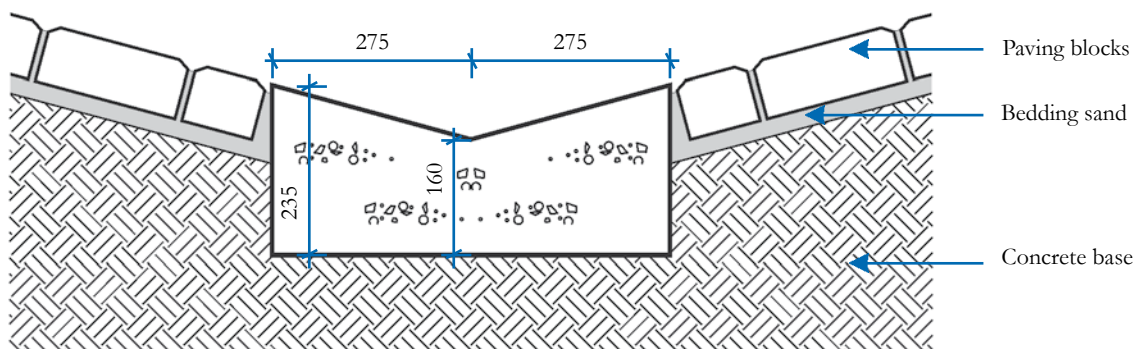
DETAIL OF DRAINAGE TO BEDDING SAND LAYER — DETAIL B
